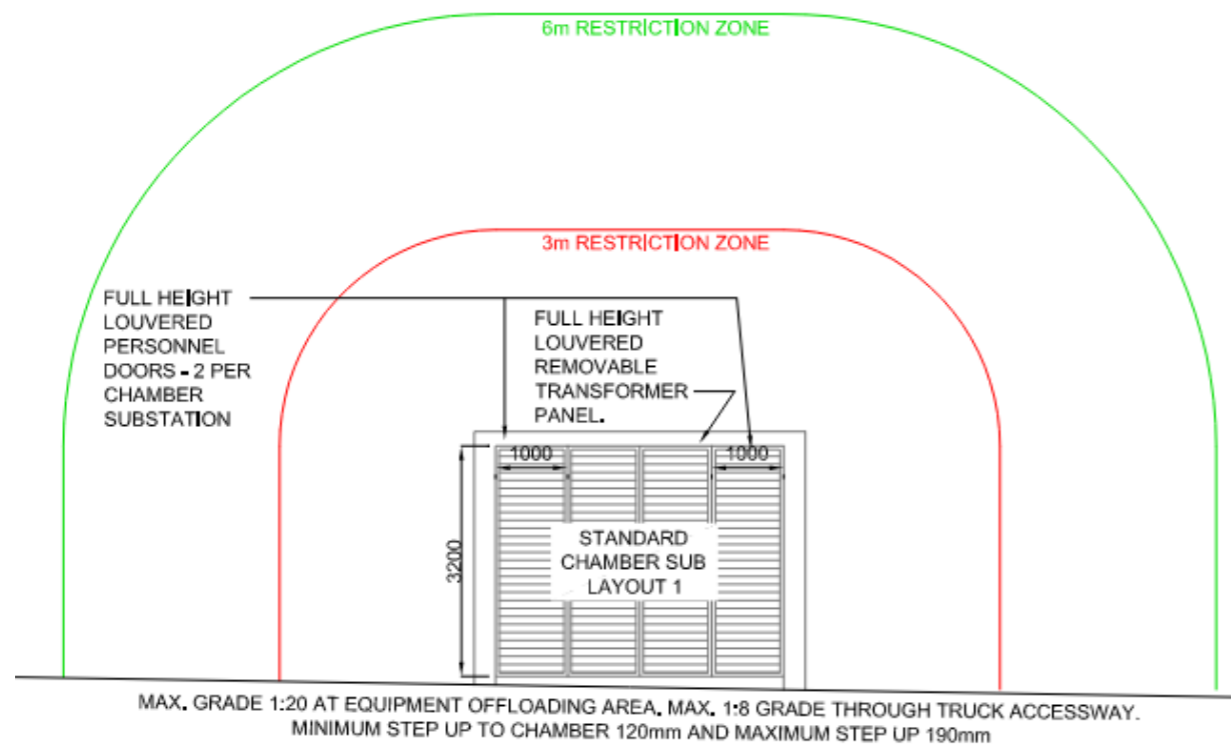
Standard 1 x 1000kVA Transformer Surface Chamber Layout - Section
